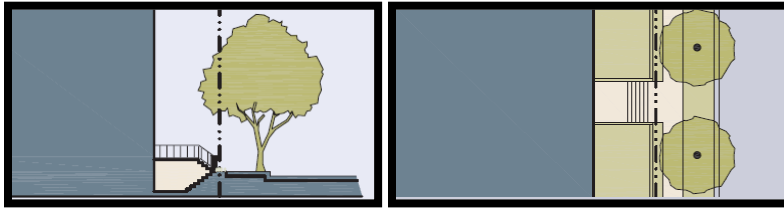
B. STOOP BUILDING FRONTAGE.
